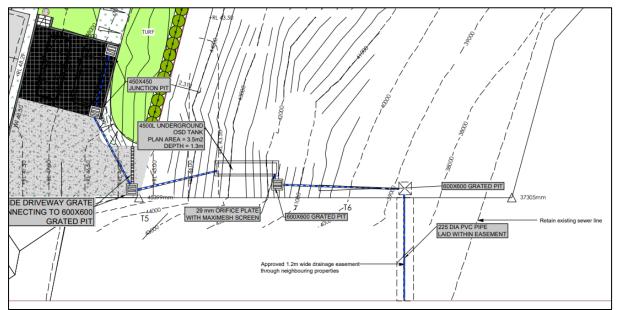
Proposed connection to existing easement. Extract from stormwater plan (LODESSA, 2024)
